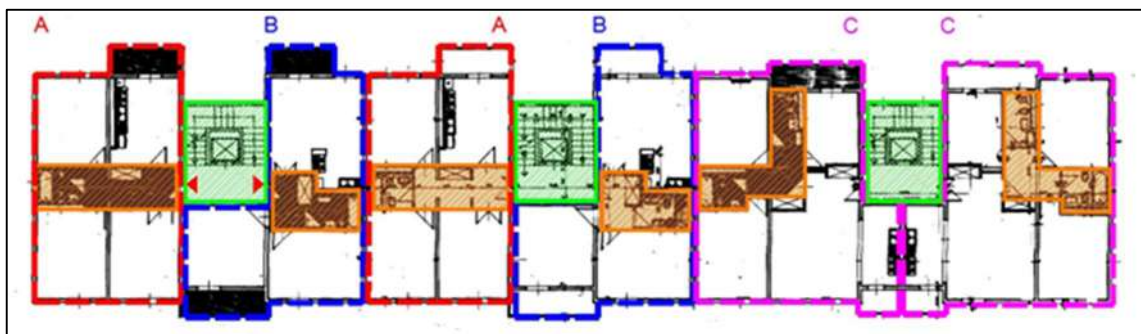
Typical Floor Plan-Building B: Service areas are highlighted in orange, in red and blue flat TYPE A and flat TYPE B respectively and in green the stairwells.
